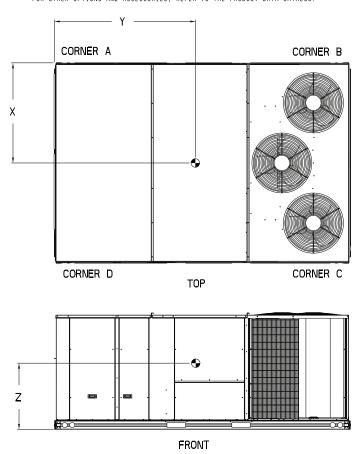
Unit Dimensional Drawing - 17 and 20 Size Units (cont.)
